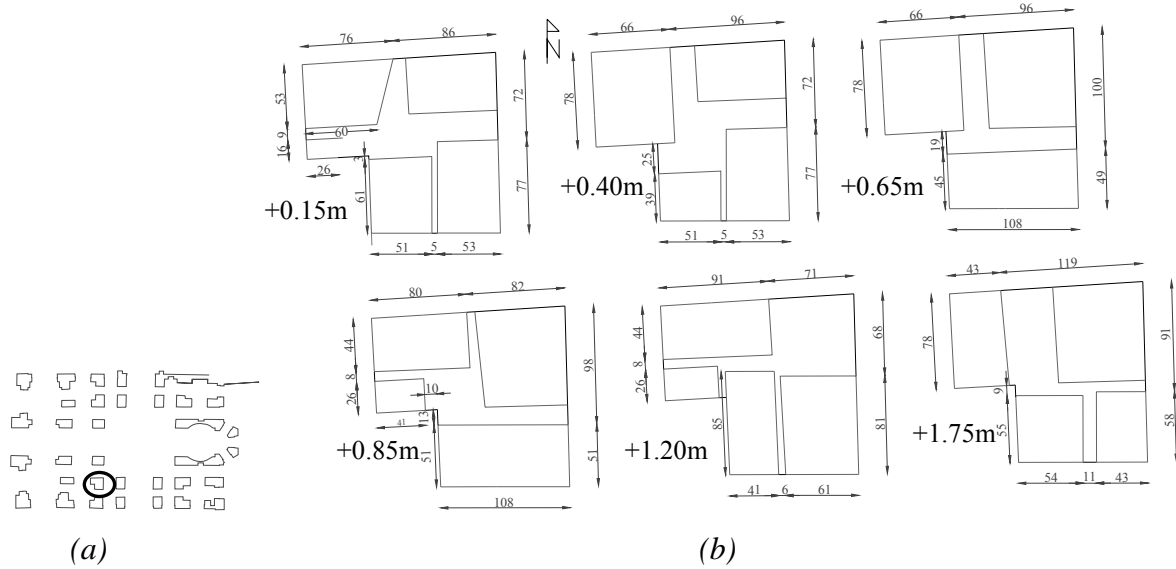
(a) Position of the pier Y32 in plan, (b) Horizontal sections of the pier Y32 (gallery-Yperoon), at various heights measured from the floor level.
